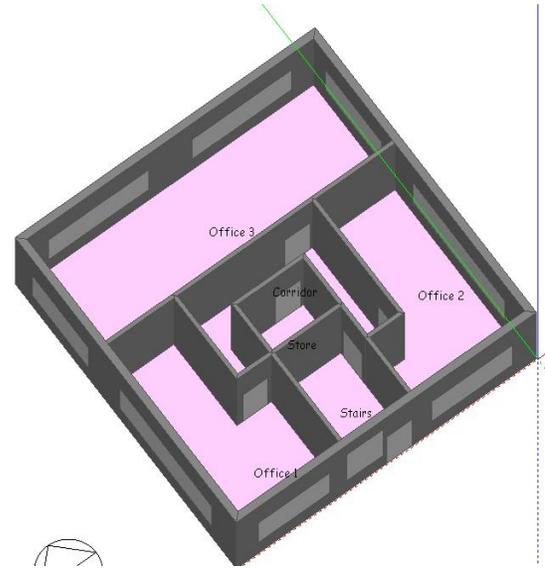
Floor plan of the simple shallow plan office building (building 3)
